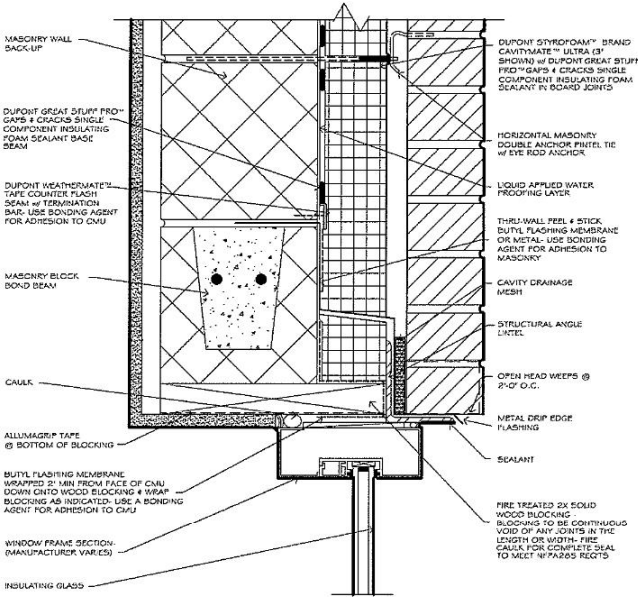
WINDOW HEAD DETAIL-FRTW WOOD BLOCKING-MASONRY WALL
